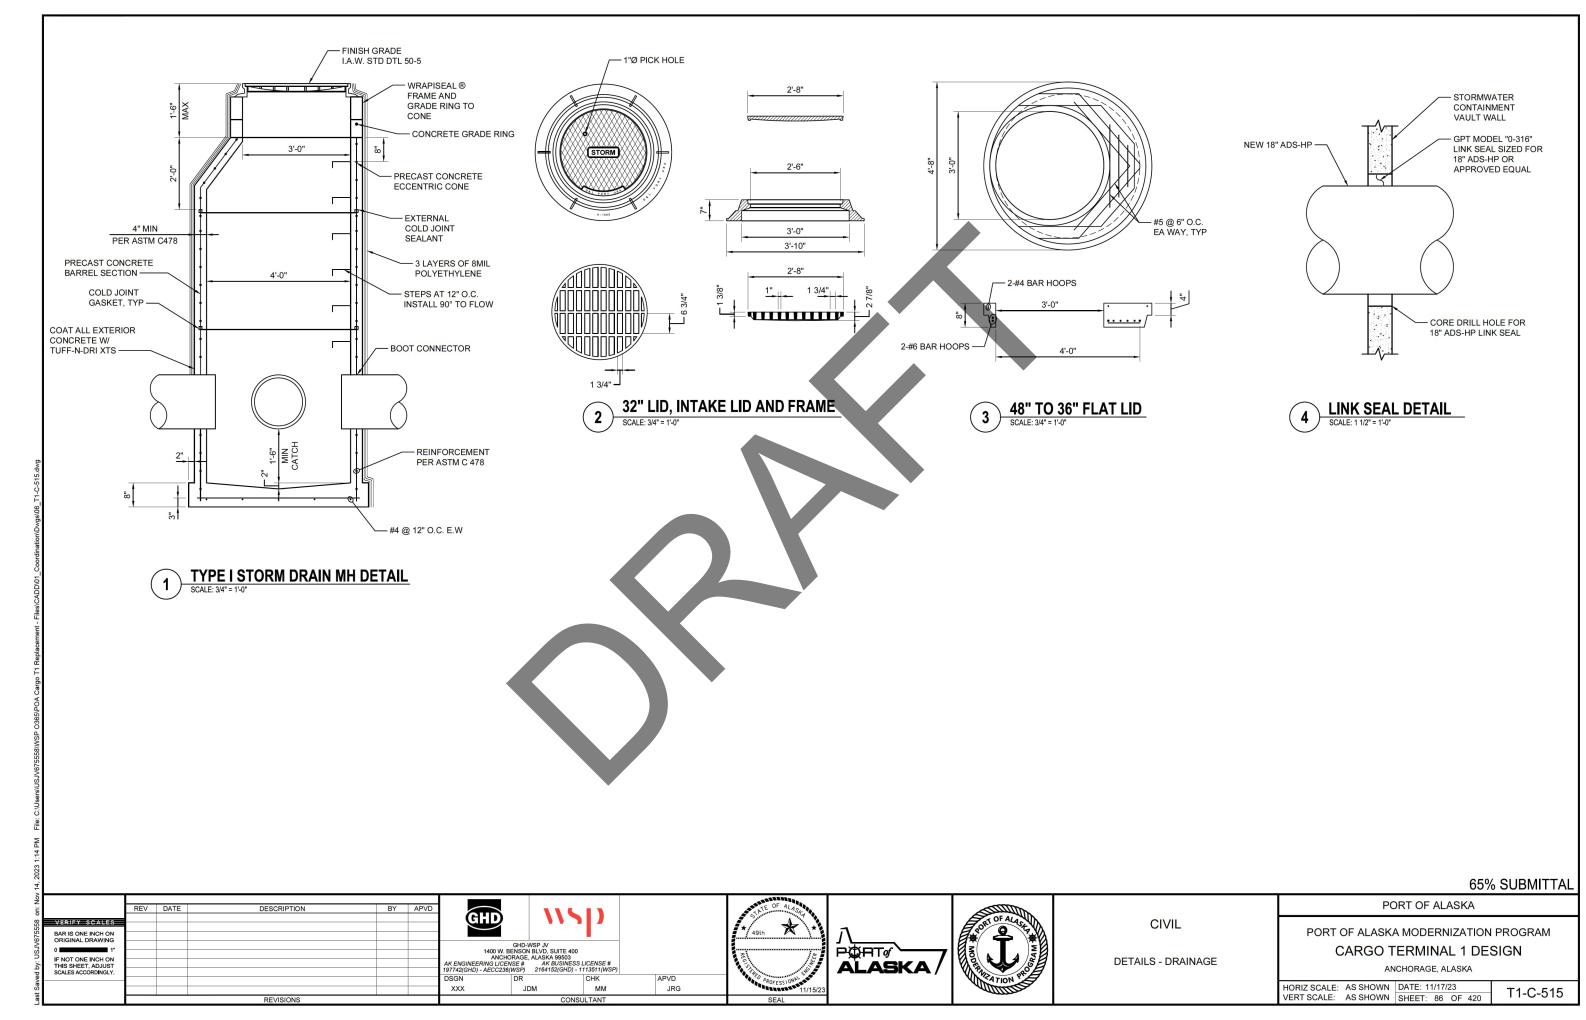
DETAILS UPLAND DRAINAGE & GRADING PORT OF ALASKA
